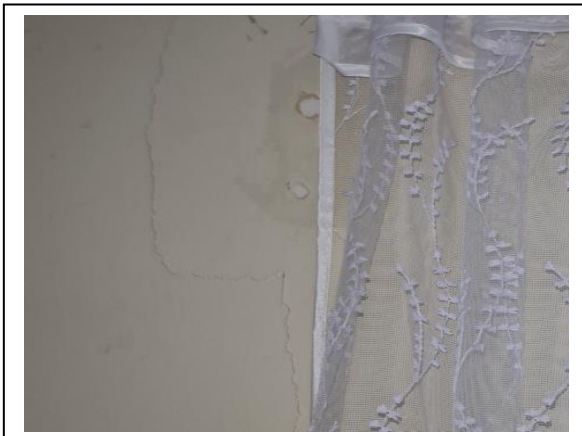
Flat 19 – Rear Left Bedroom - Cracking to LHS of Window
